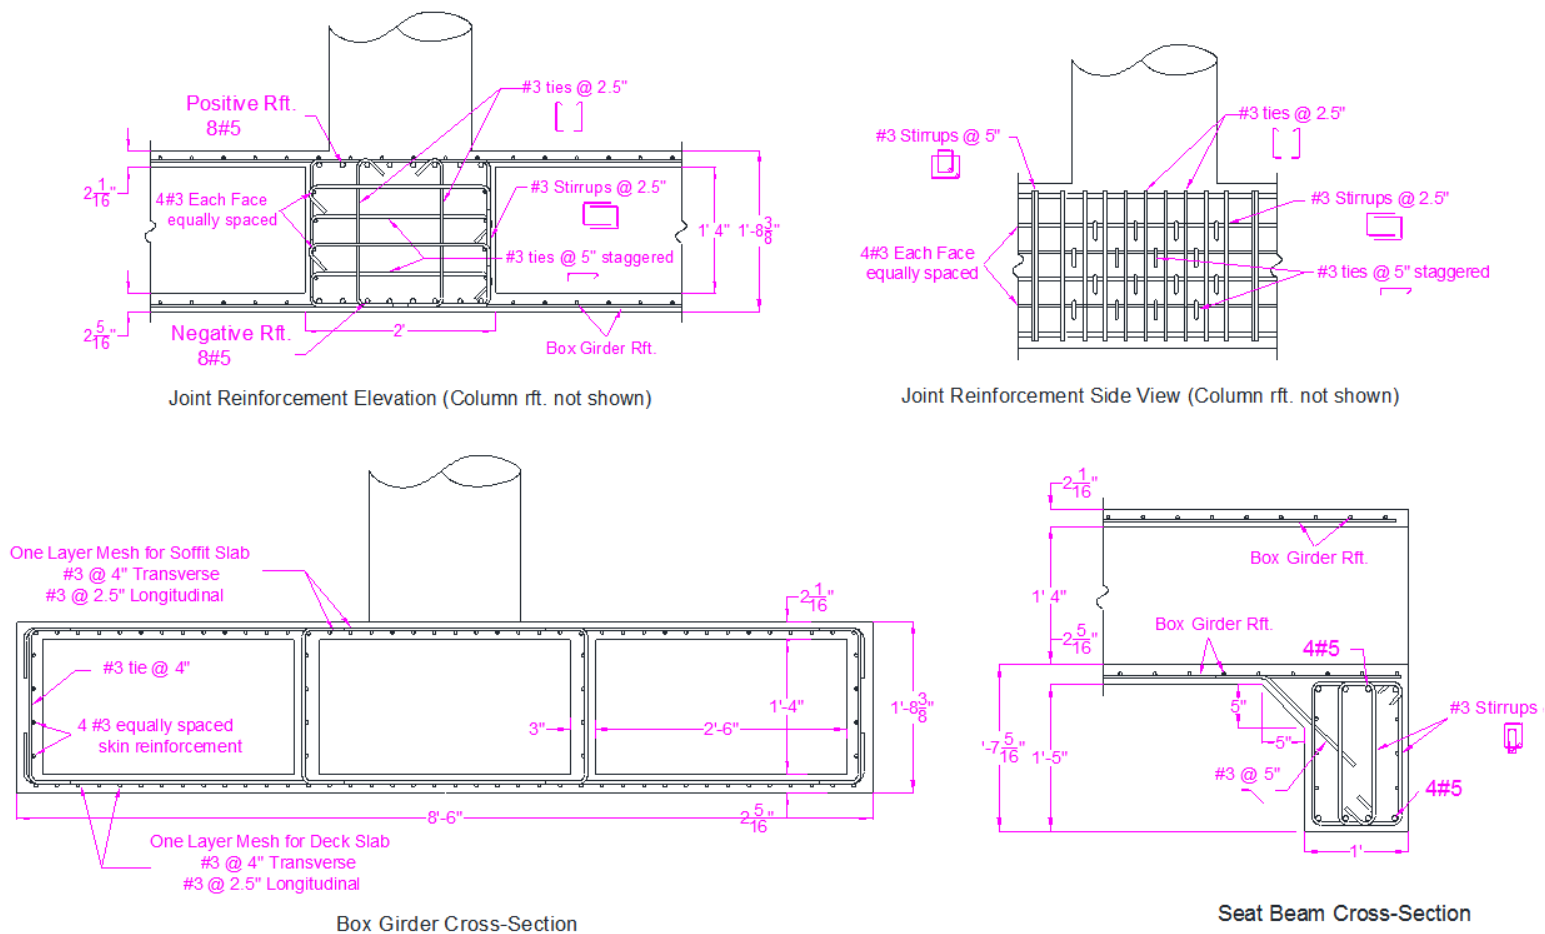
Details of longitudinal and transverse reinforcement for the specimens' joint, box-girder, and beam section.
